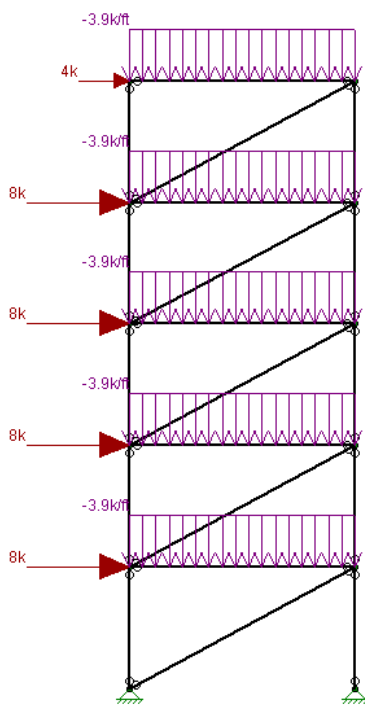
Stair Tower on 26' Long Side with Loads Shown (Generated from RISA program)
